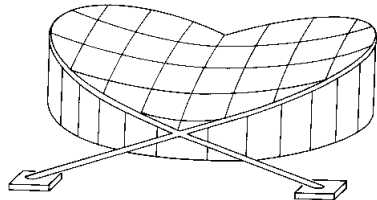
Suspension roof built in Raleigh, North Carolina.
